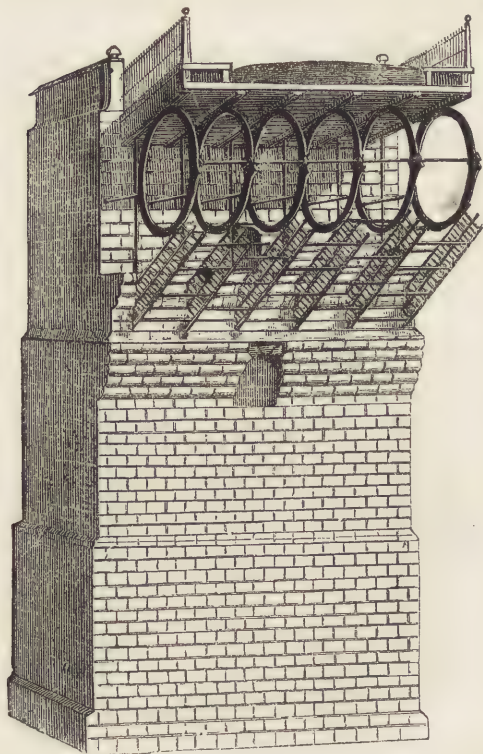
SECTION OF THE IRON BRIDGE AT SUNDERLAND, 20 FEET FROM THE NORTHERN ABUTMENT.
